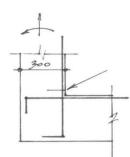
Wall section, 300 mm thick, eccentrically loaded
